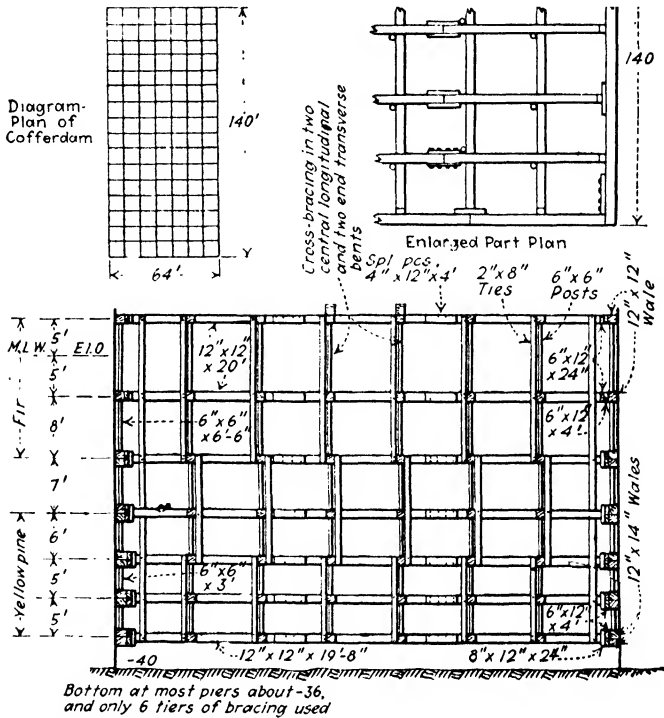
Bracing of Cofferdam for Arlington Memorial Bridge.
